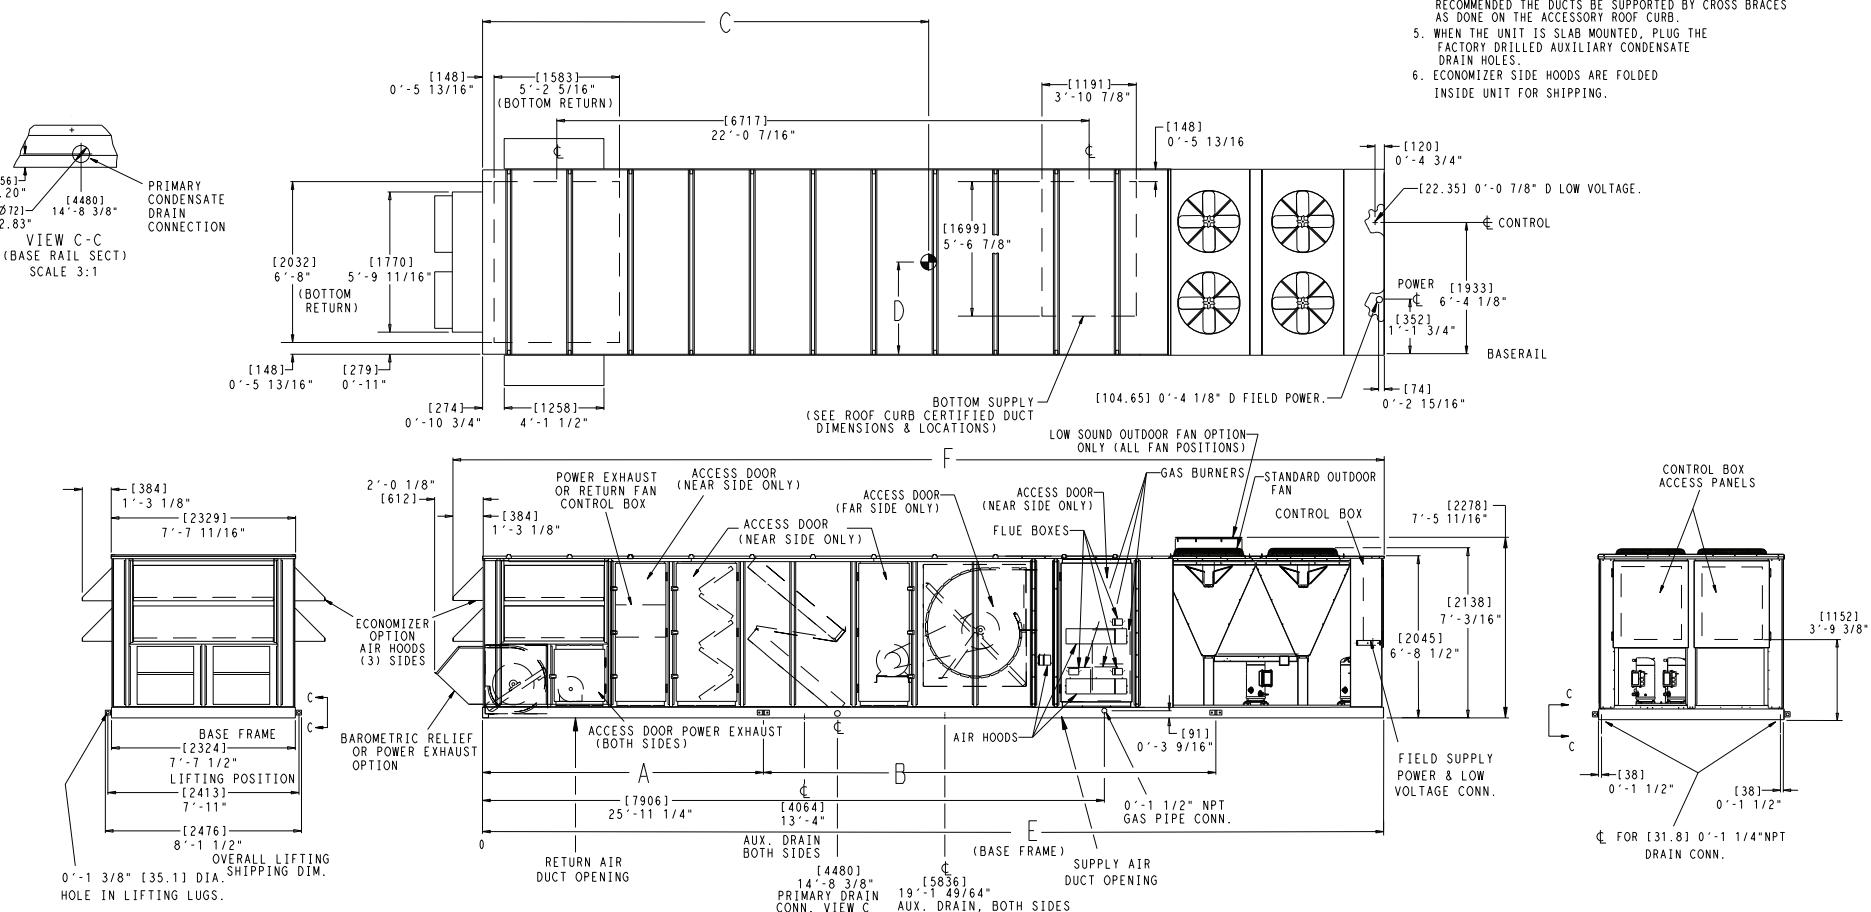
Base Unit Dimensional Drawing — 48P2,P3,P6,P7070 (Standard Chassis Unit Shown)
